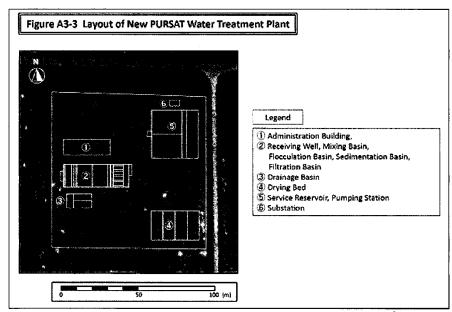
Layout of New WTP (one of the alternative layouts) (3)
